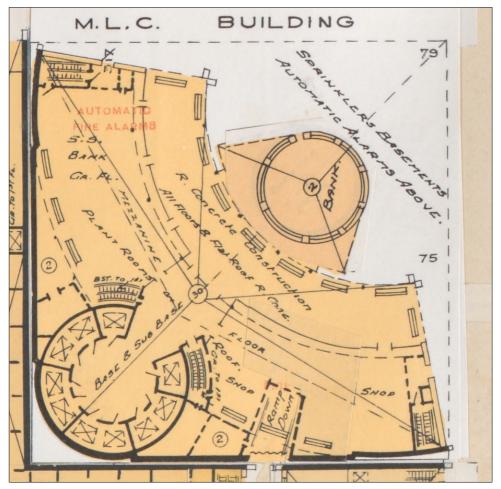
A Mahlstedt fire insurance plan showing the original ground floor layout of the MLC Building. Source: State Library of Victoria.
